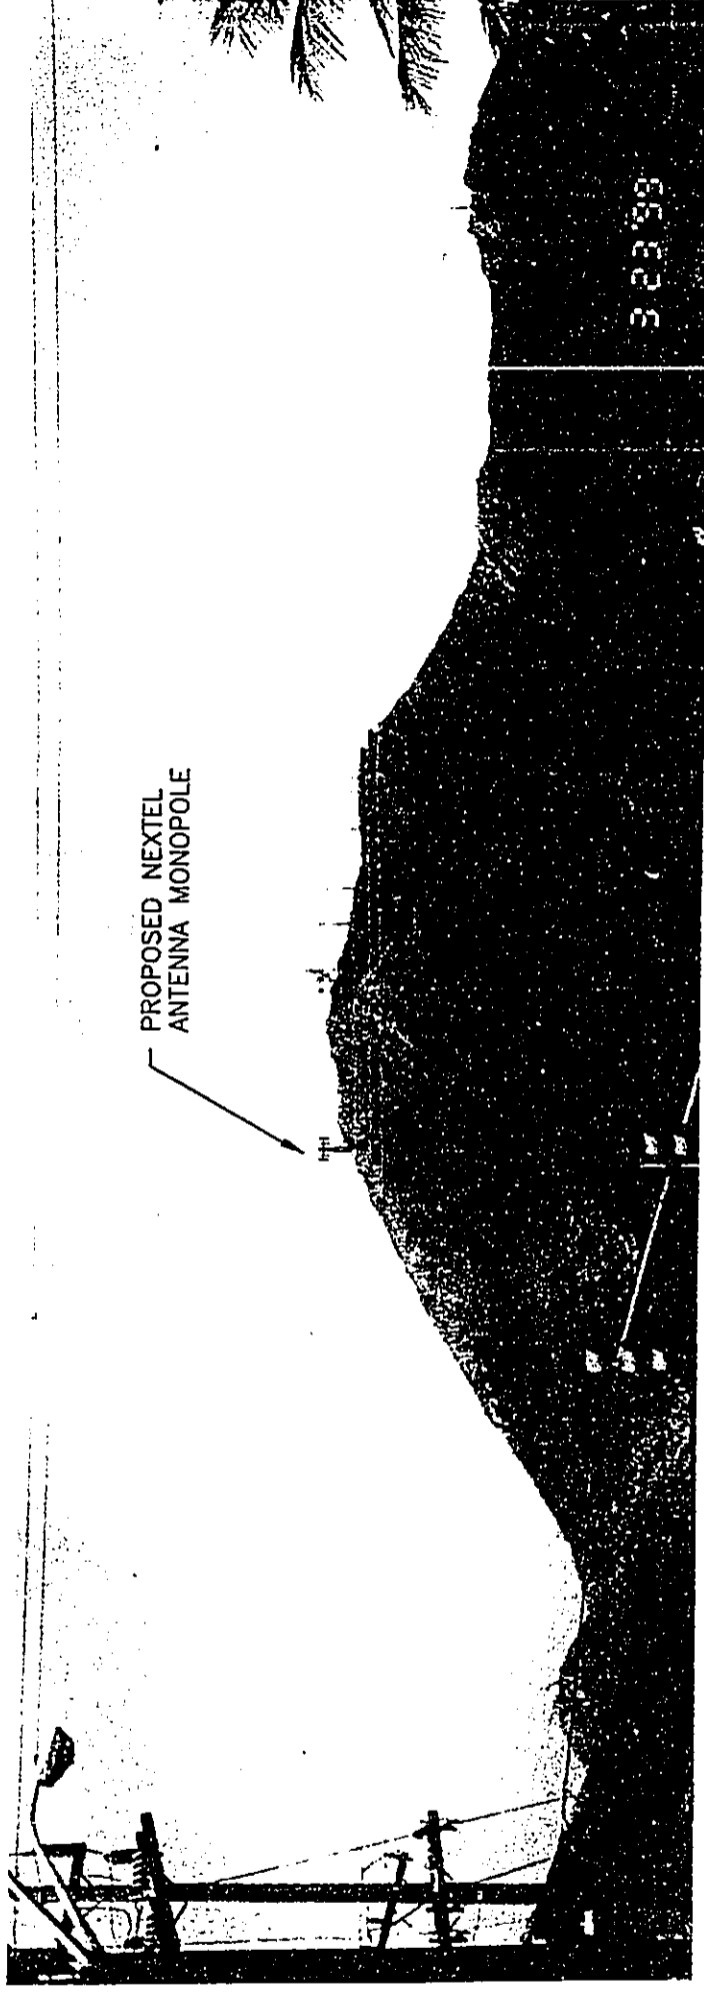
TELEPHOTO SHOT FROM PHOTO 13 VANTAGE POINT (90 mm lens) (ALTERNATIVE MONOPOLE) EXHIBIT N - 1
